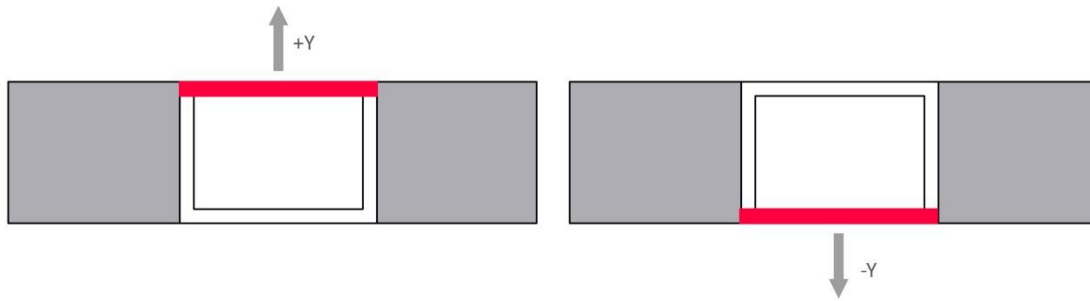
In the case above, only the direction +Y and -Y should be evaluated because walls perpendicular to loading direction +X and -X are not likely to fail out-of-plane because of the presence of an adjacent building (plan view)
